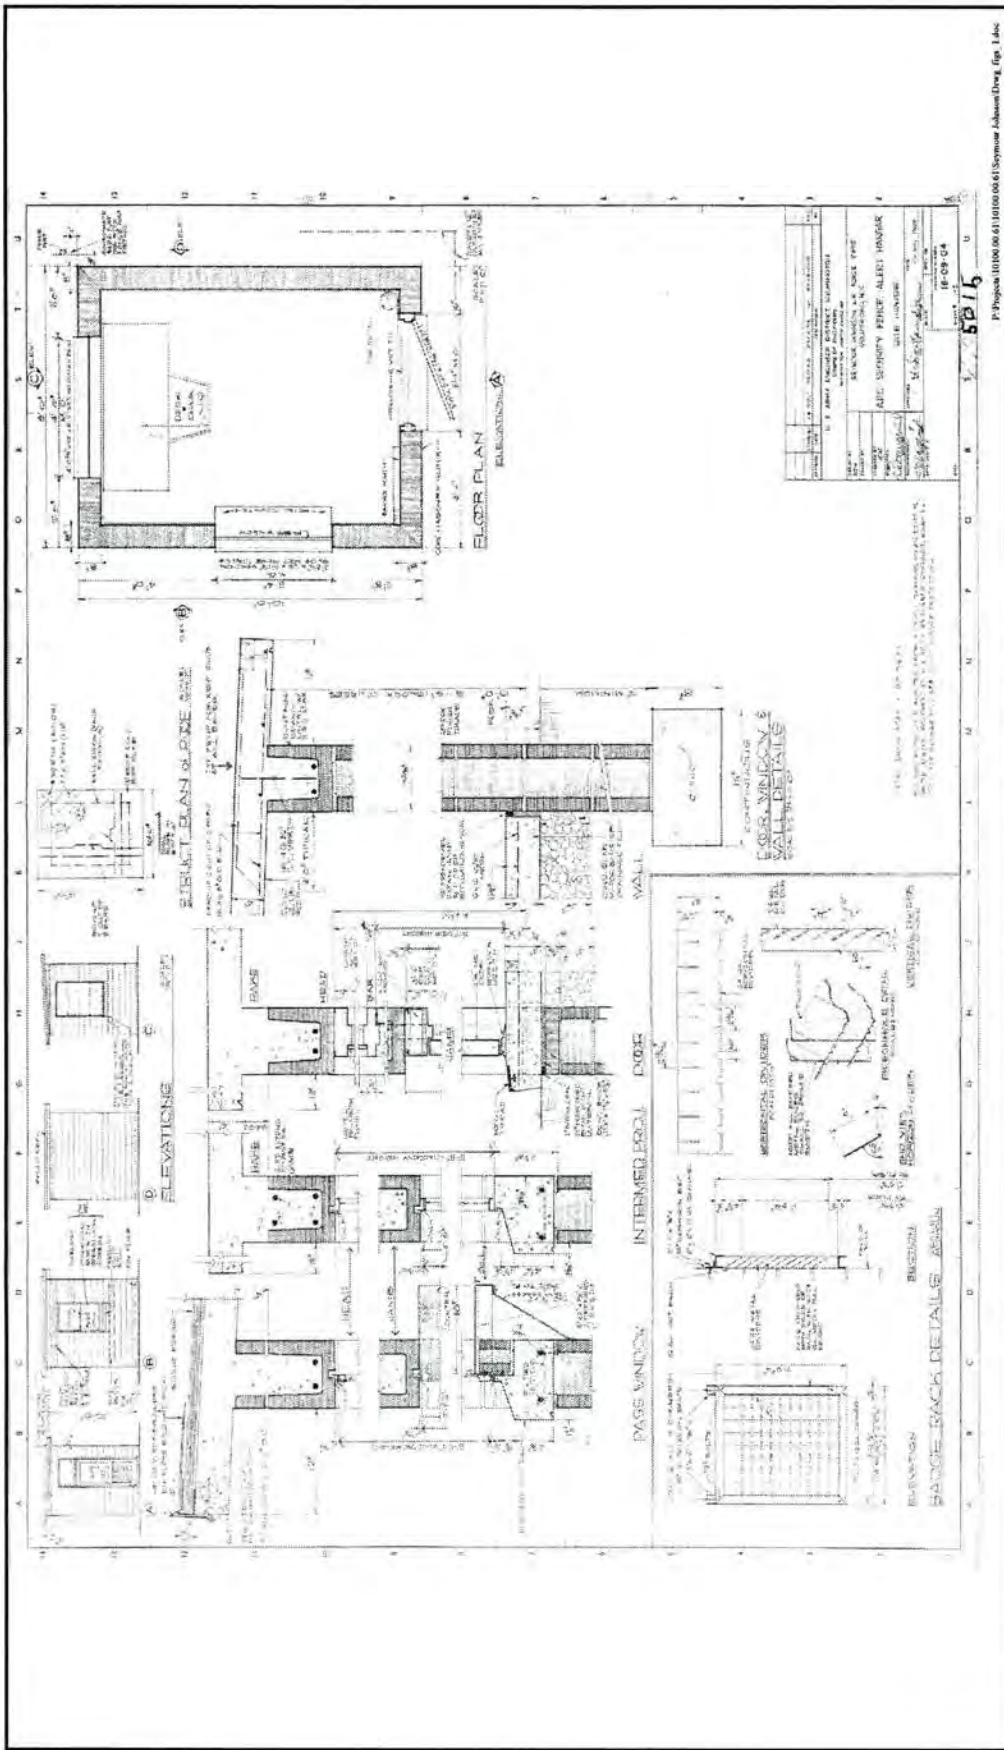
Building 5014 (gate house associated with Building 5015)—record drawing, A.D.C. security fence, alert hanger gate house, 1959 (Source: Seymour Johnson Air Force Base Civil Engineering Vault)
